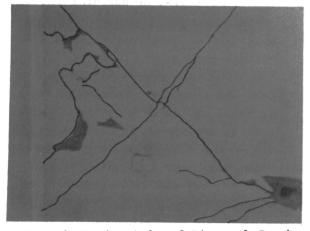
Horizontal and Diagonal Cracks on an External Wall.
